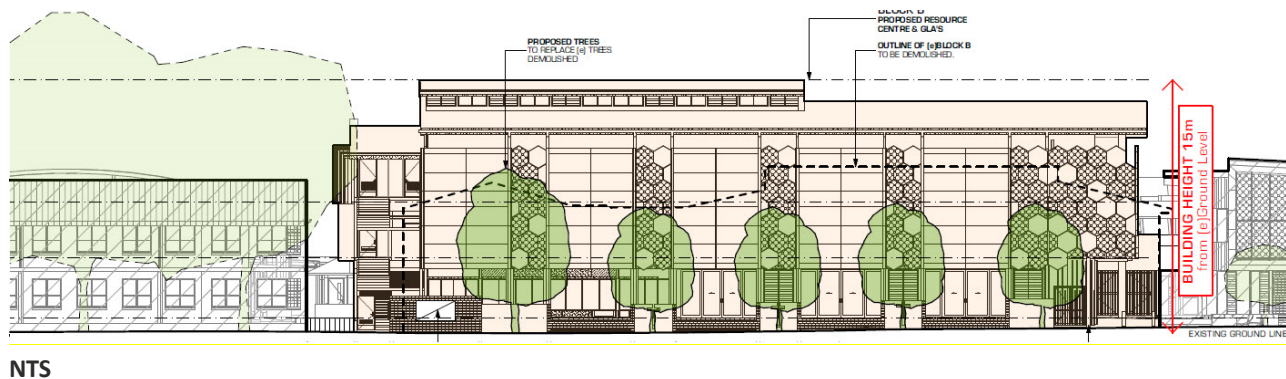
Proposed Donovan Avenue elevation (Source: QOH Architects, 2940)
